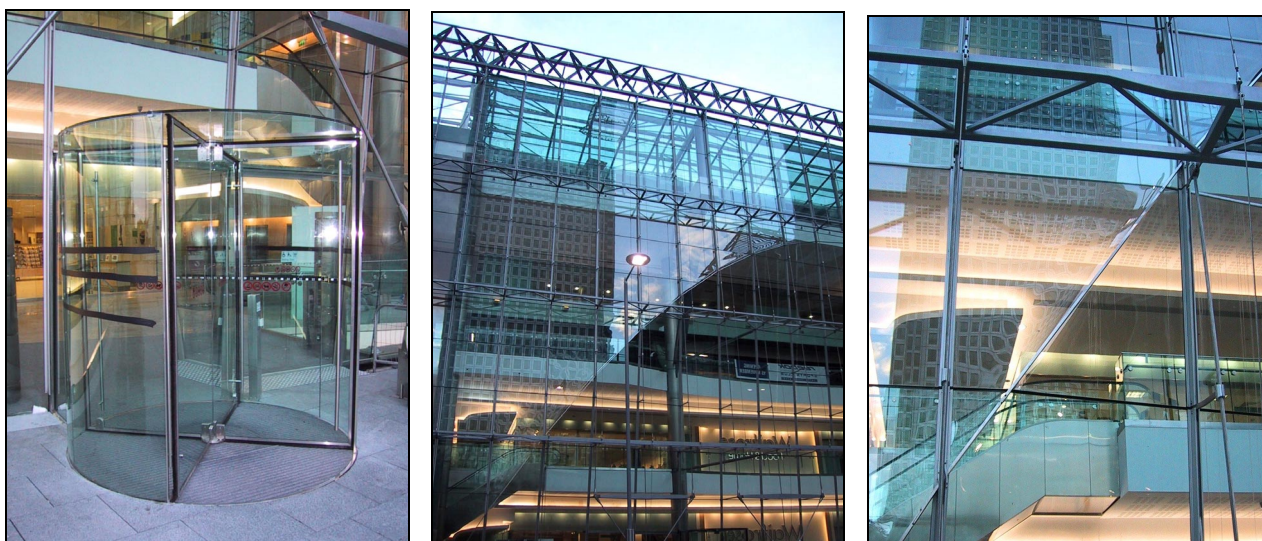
Curved glazing revolving door (left); partially bent façade glazing to form transition zone between a straight façade with a cone area (center and right) [1]
